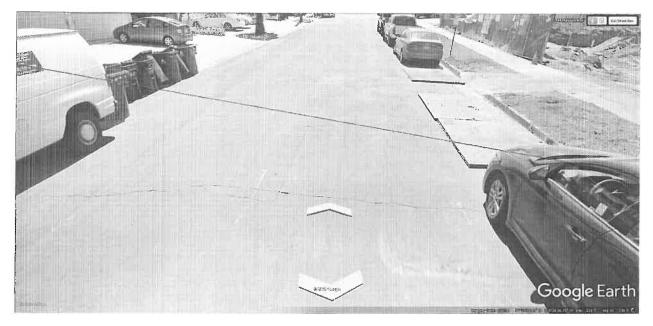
Fault runs across Malcolm into site. Roadway cracks from surface faulting run into site.
